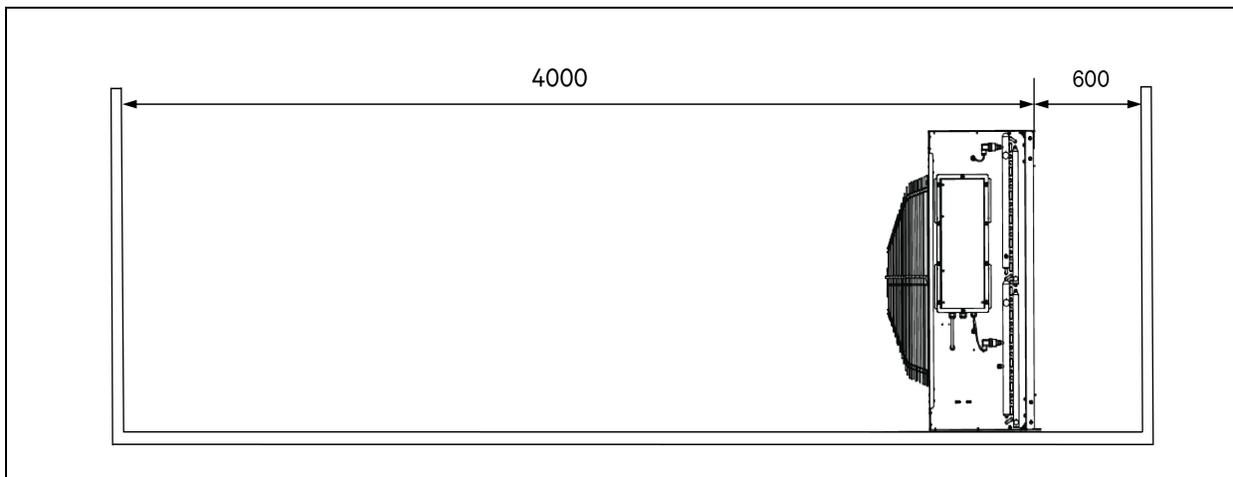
Space Requirements for Vertical Installation (Unit: mm)
